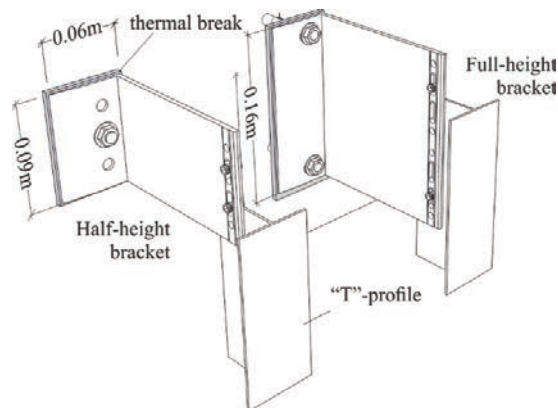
Sketch of the brackets used in E2VENT system. Half-height bracket is used in positions between floors and full height brackets in positions at floor level
